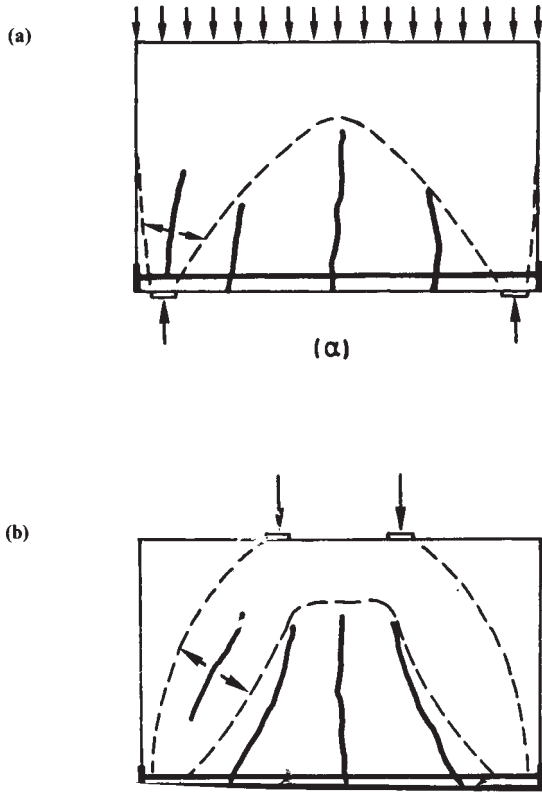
Typical inclined compression failures of deep beams under (a) uniform (b) two-point loading.
